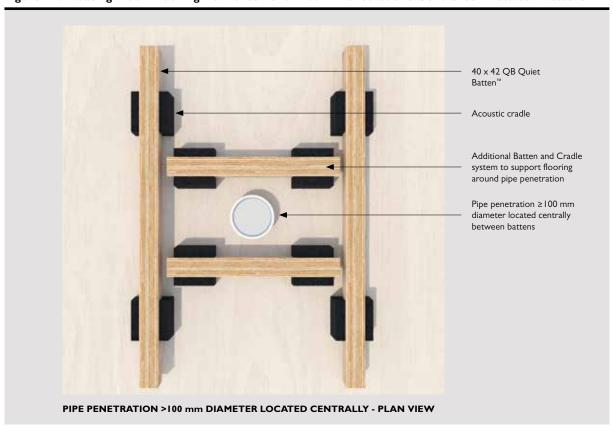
Floating Floor Flooring Reinforcement Around Penetrations Centralised Between Battens
